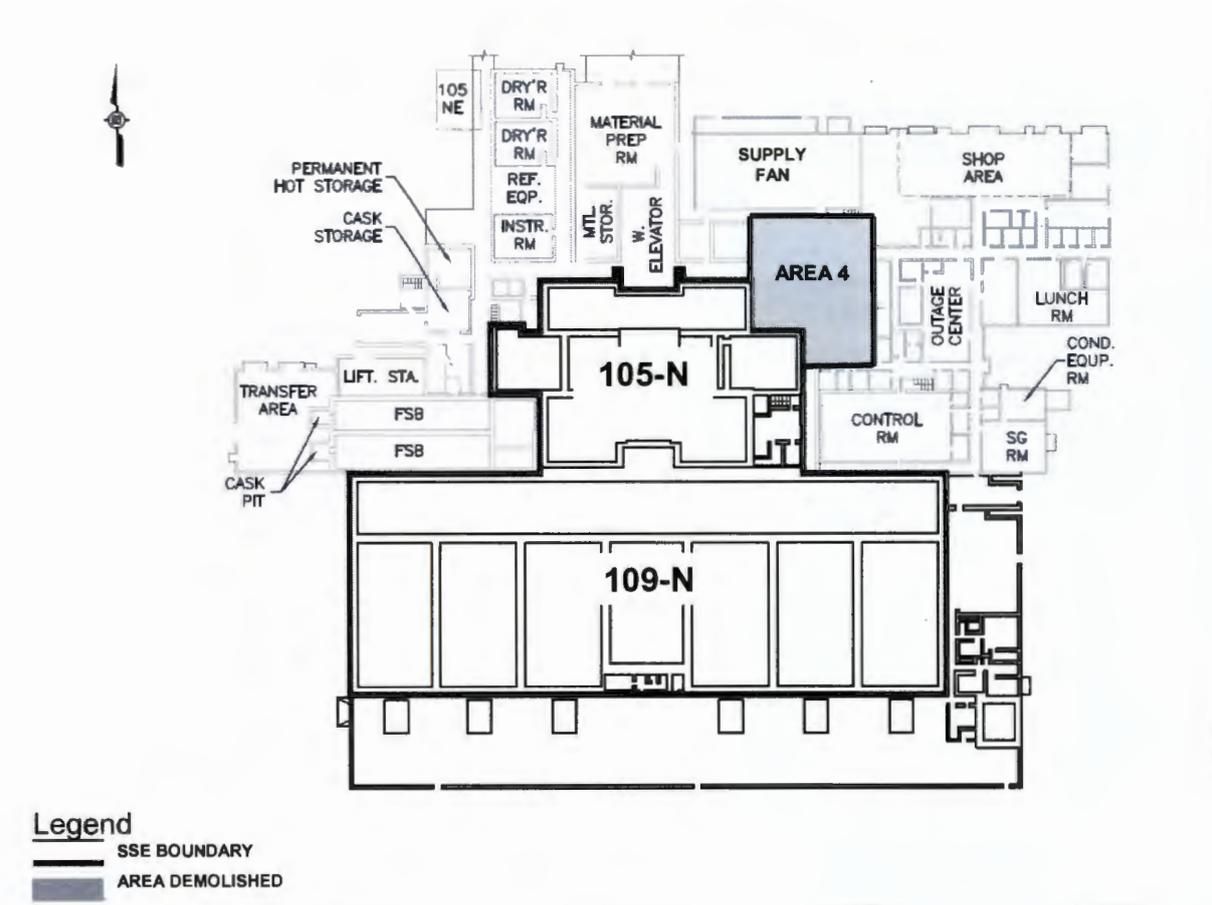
shows the area of the 105-N Building in which Stair 4 and F Elevator were located. Figure 4-2 provides an aerial photograph of the area as it appeared in 2008. Demolition of this area was conducted from January through March 2010. The 1605-NE East Observation Post was located on the roof of the 105-N building near this area (Figure 4-2). Its demolition is documented in Facility Status Change Form D4-100N-0043.
